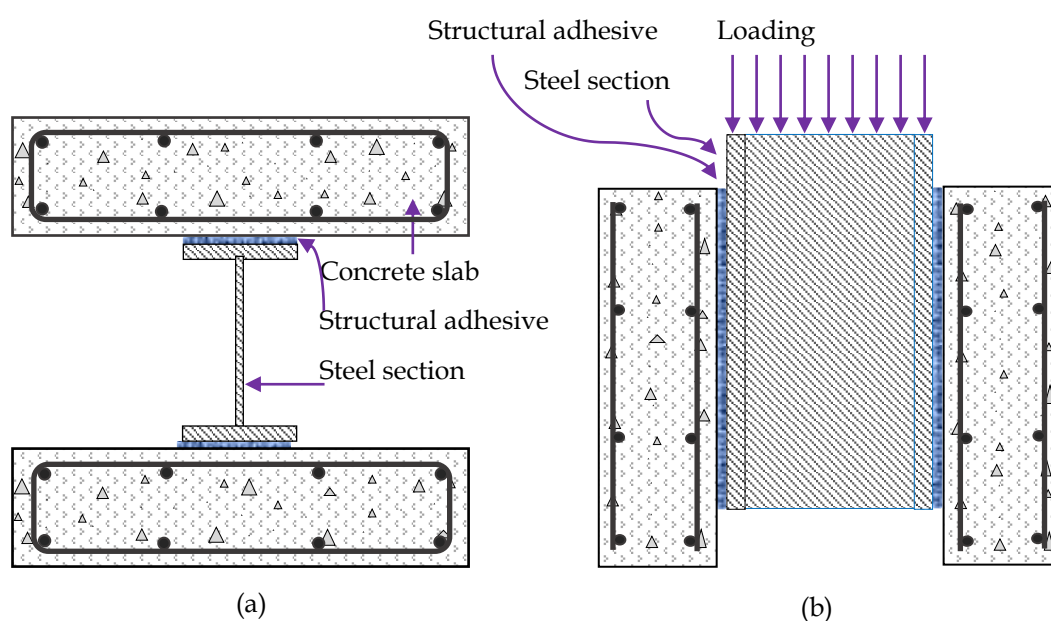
Steel-concrete composite vertical push-out specimen bonded with adhesive as per EC4 (2004); (a) top view and (b) side view
